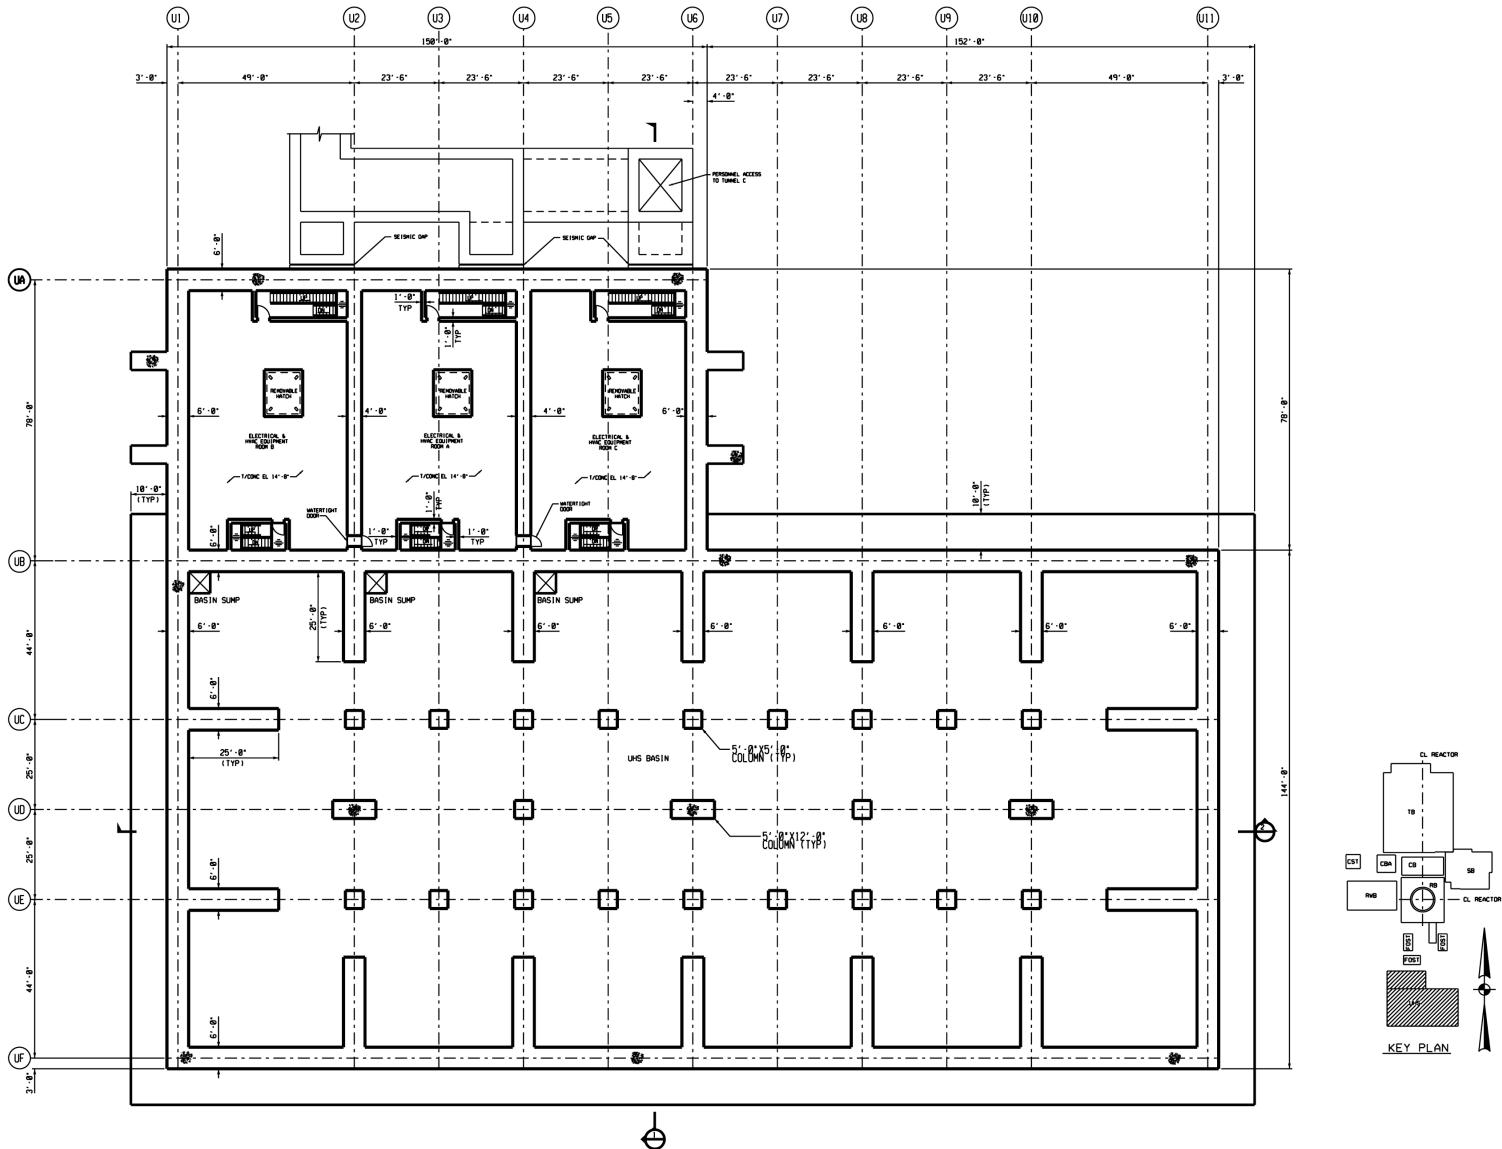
H.6-259 UHS Basin Plan at Elevation 14'-0"
